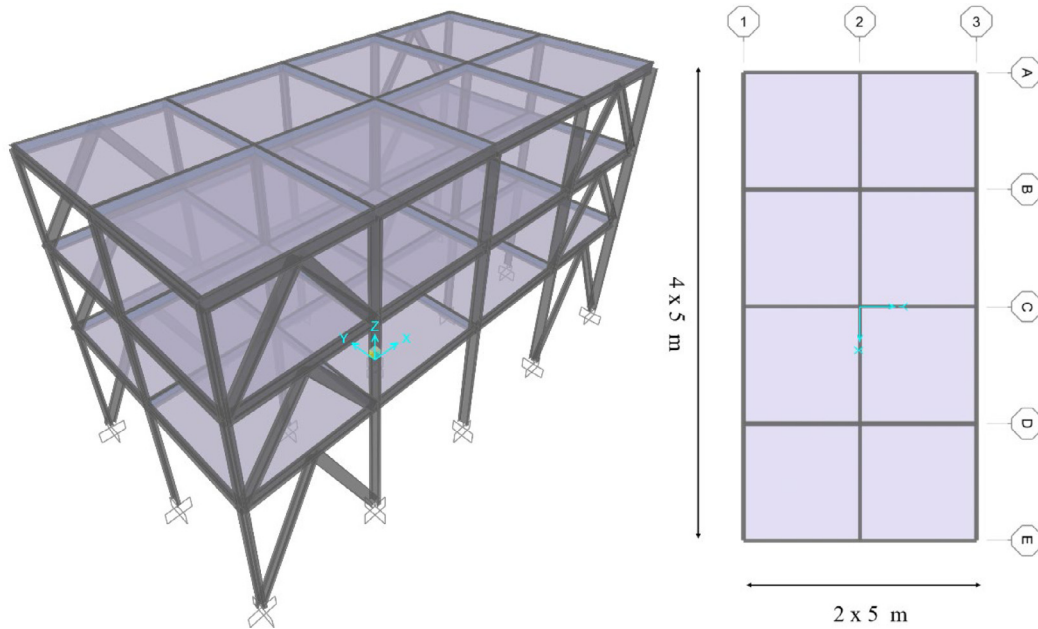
The schematic representation and plan views of the 3-story steel structure.
